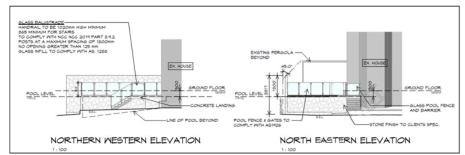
North East and North West Elevations (internal views within site) (Prime Design, 2022)
